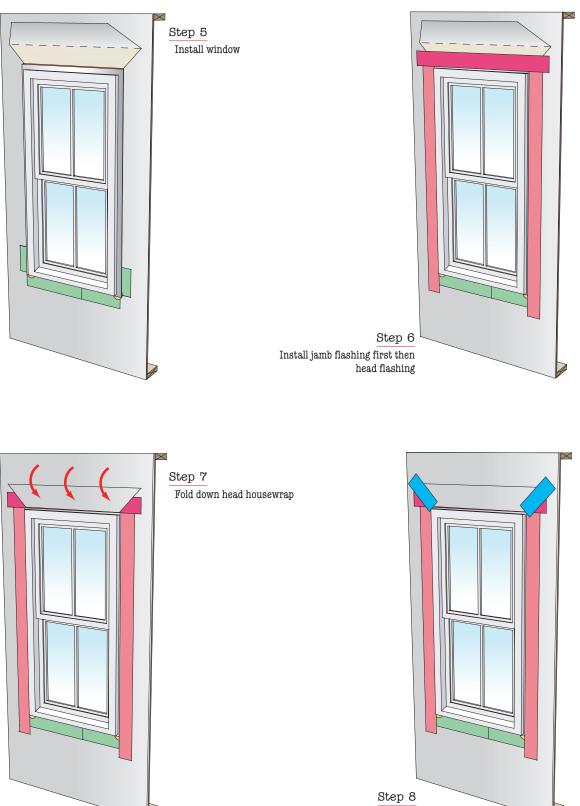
Installing window with housewrap on OSB over a wood frame wal
